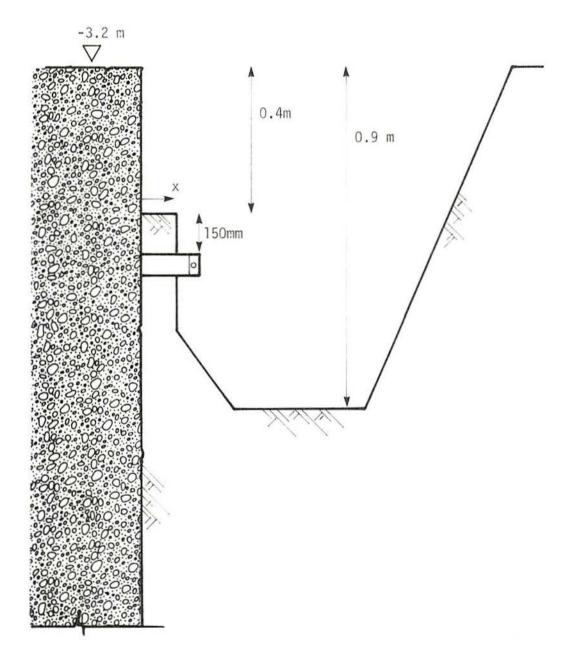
LAYOUT OF SAMPLING NEAR PILE 37
